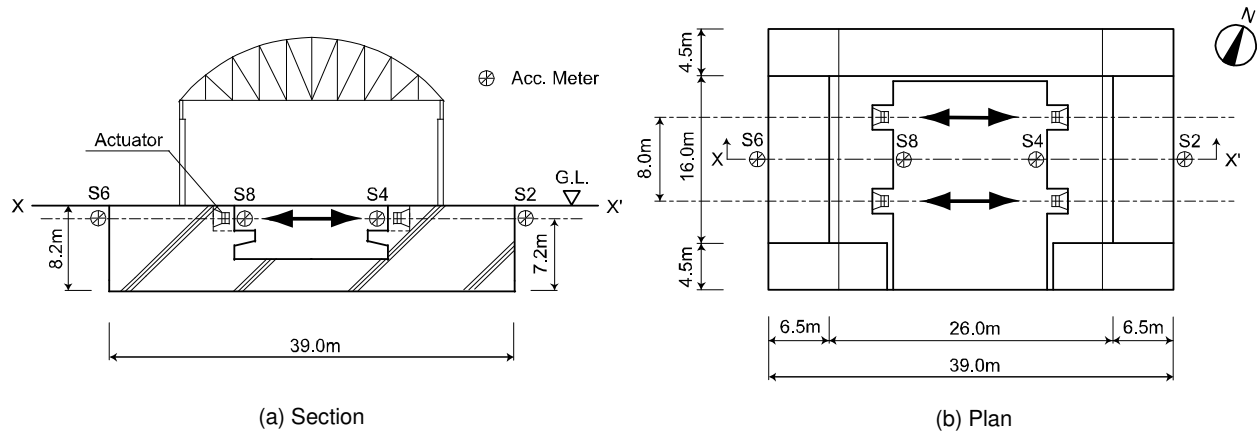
Outline of shaking-table-foundation and location of accelerometers.
